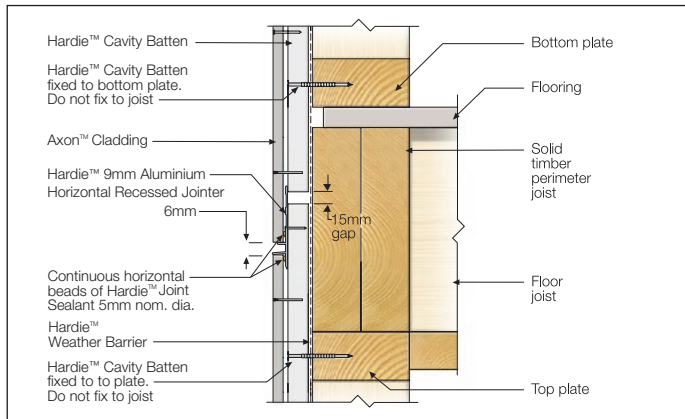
FLOOR LEVEL JUNCTION - HORIZONTAL RECESSED JOINTER
